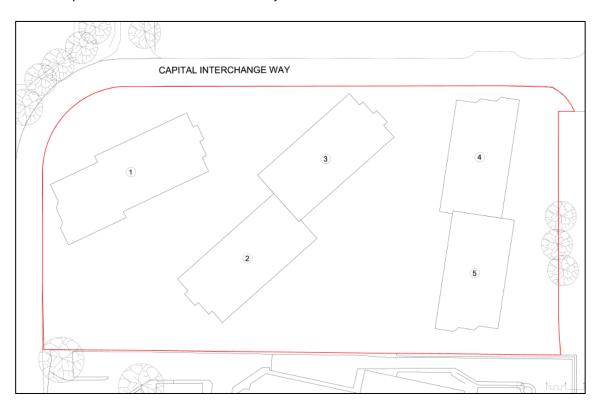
proposed site block plan (1699_DWG_PL_XX_00_002_rev00)
